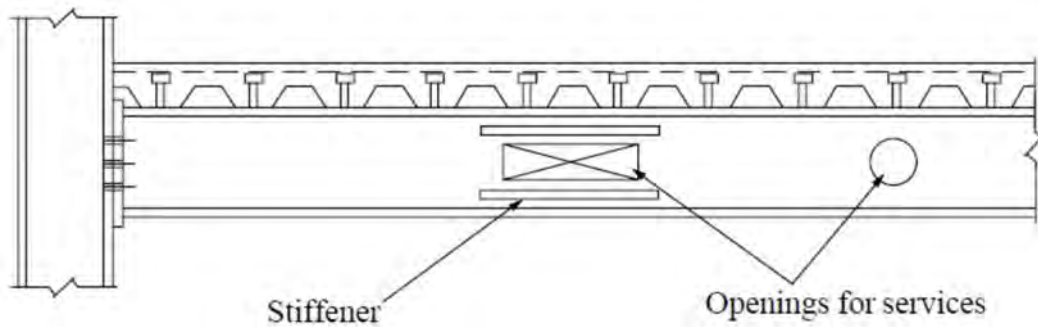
Composite beam with web opening and horizontal reinforcement (Uy and Liew 2002).
